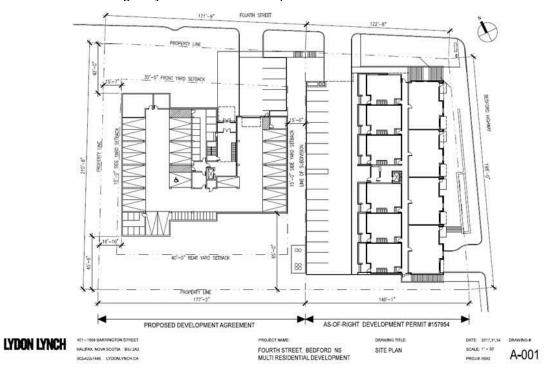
Bedford Highway & Fourth Street Proposed Site Plan
